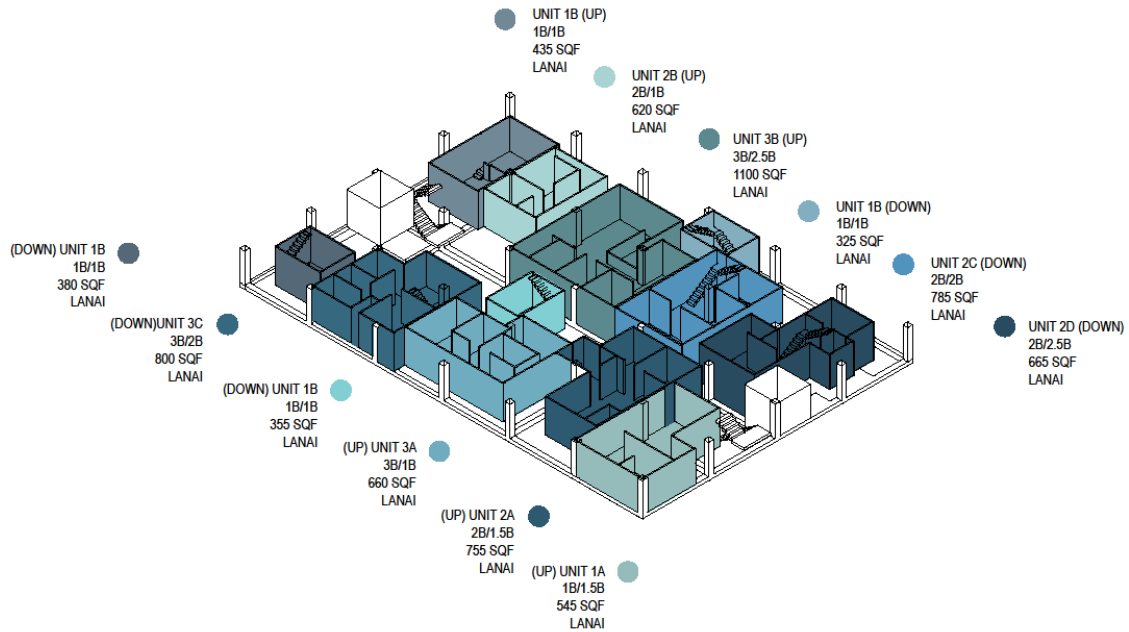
Residential Floor - Where Up and Down Units Meet - Isometric
